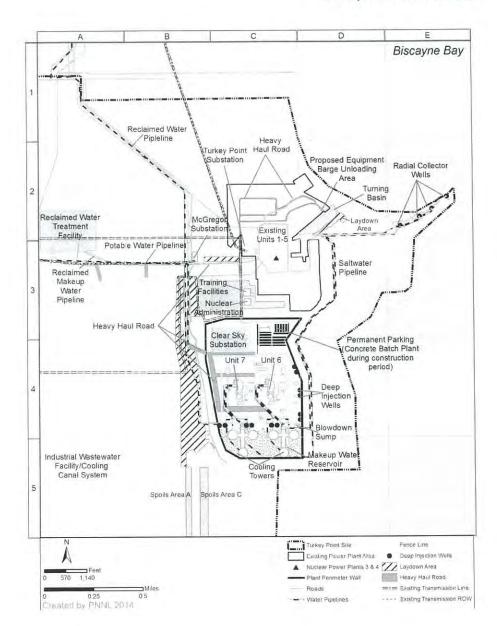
Site layout for Units 6 and 7 and associated facilities.
